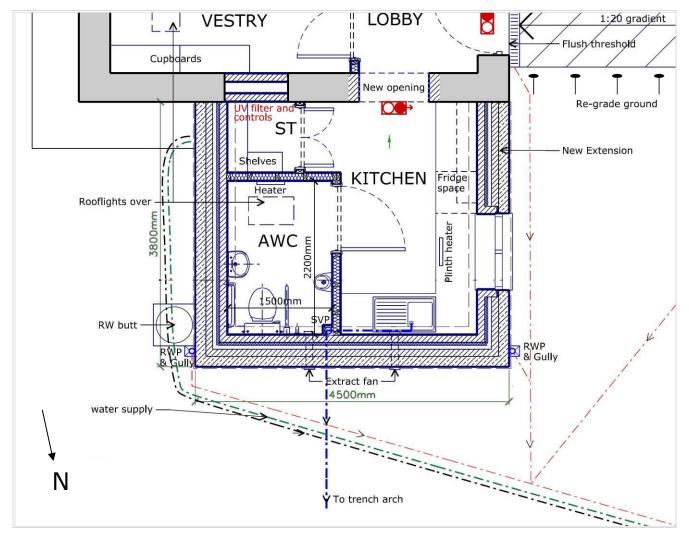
Detailed plan of proposed church extension. Plan supplied by client.
